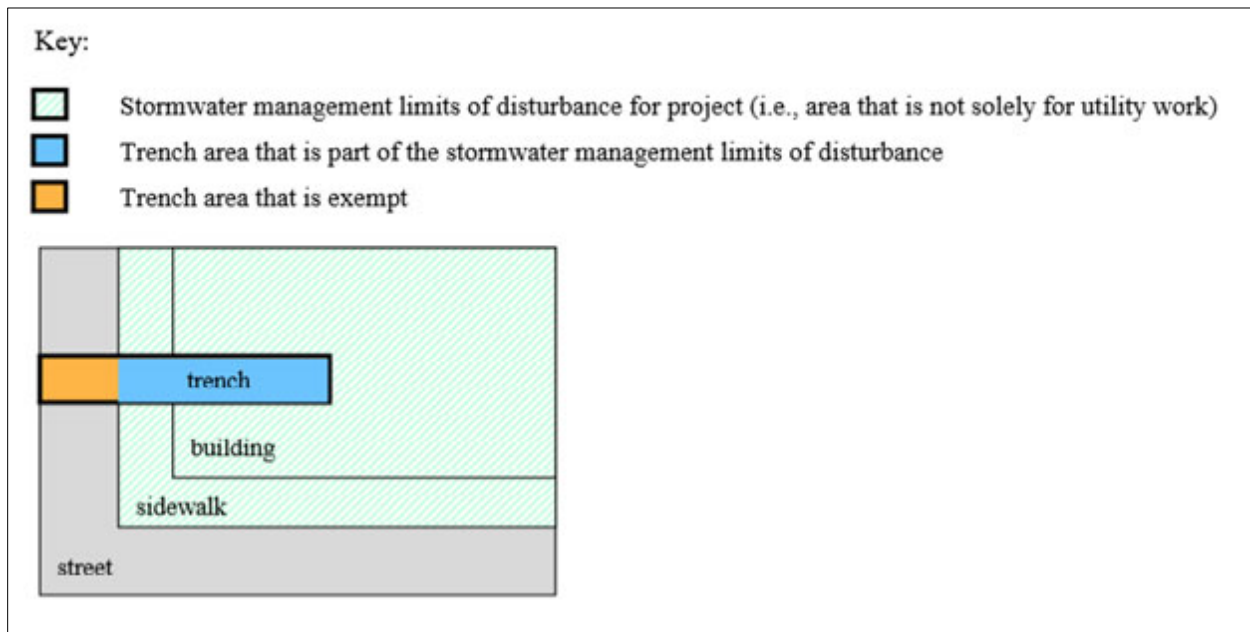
Utility trench exemption example with building and sidewalk in LOD.
